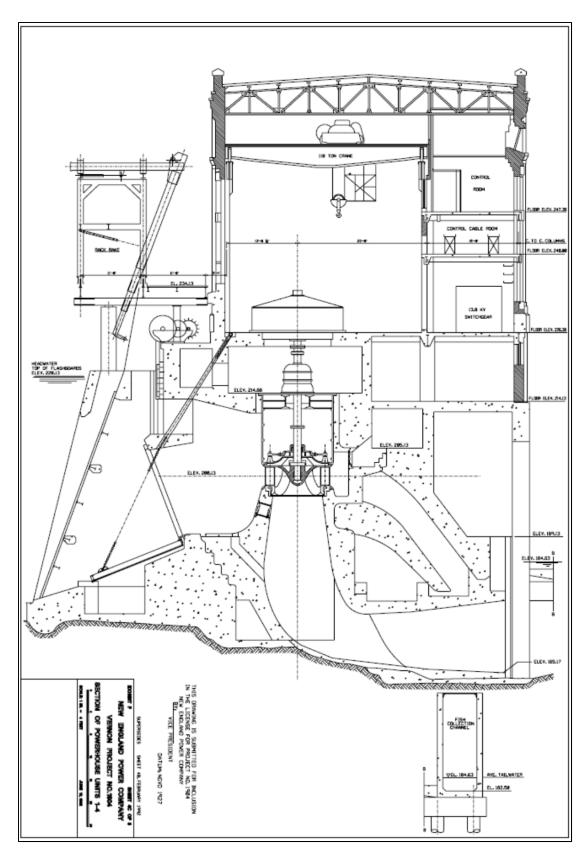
Powerhouse cross section (Units No. 1- No. 4).
